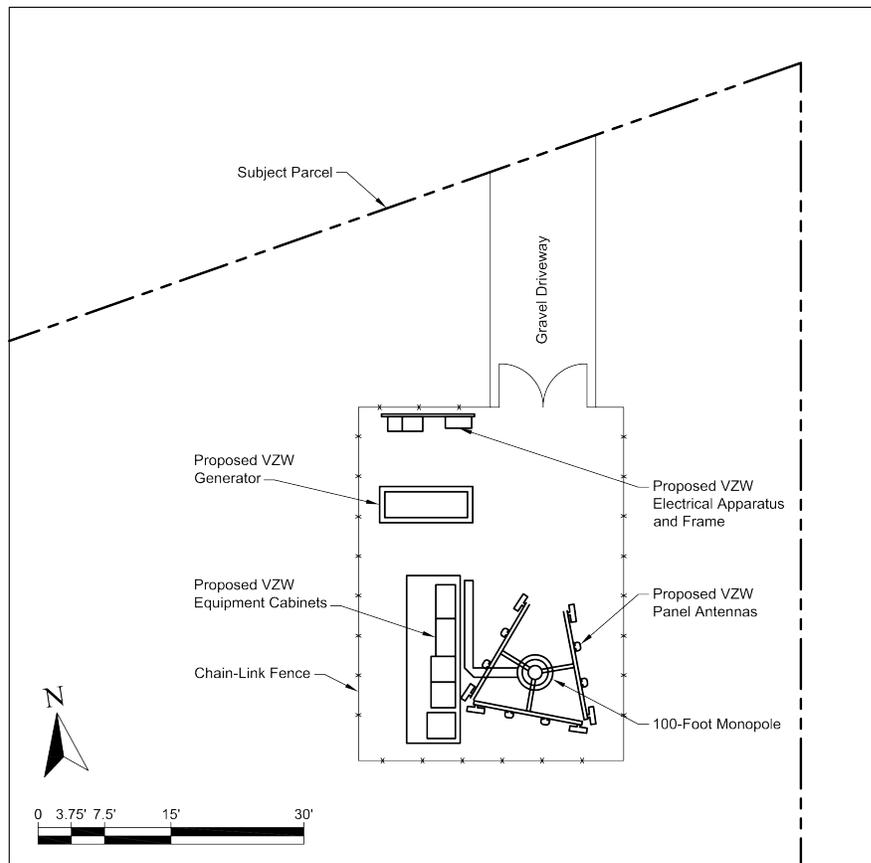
Proposed VZW HI3 Kona Airport cell site plan, adapted from a plan provided courtesy of Bureau Veritas North America.
